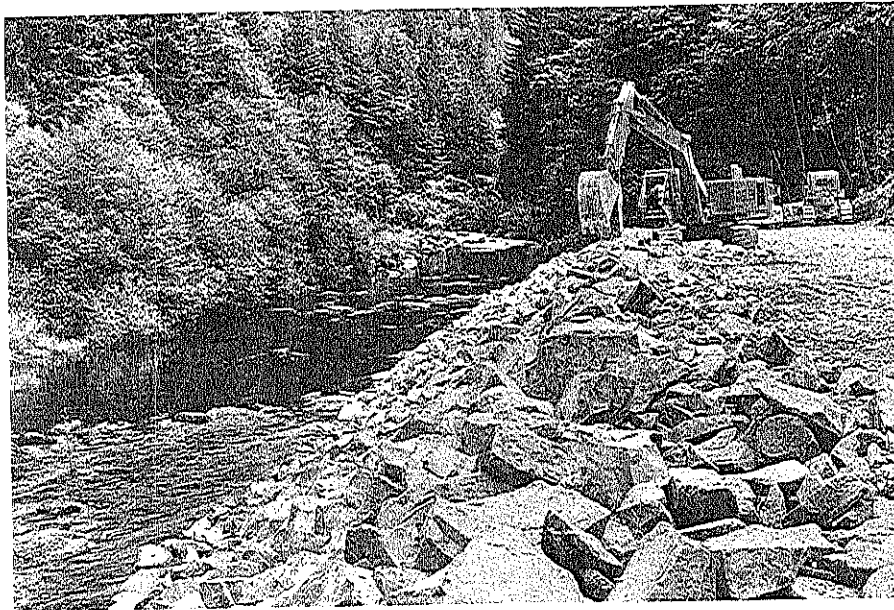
Faraday Slide. Constructing the riprap outer slope using a backhoe (Photo: September 5, 1989).
